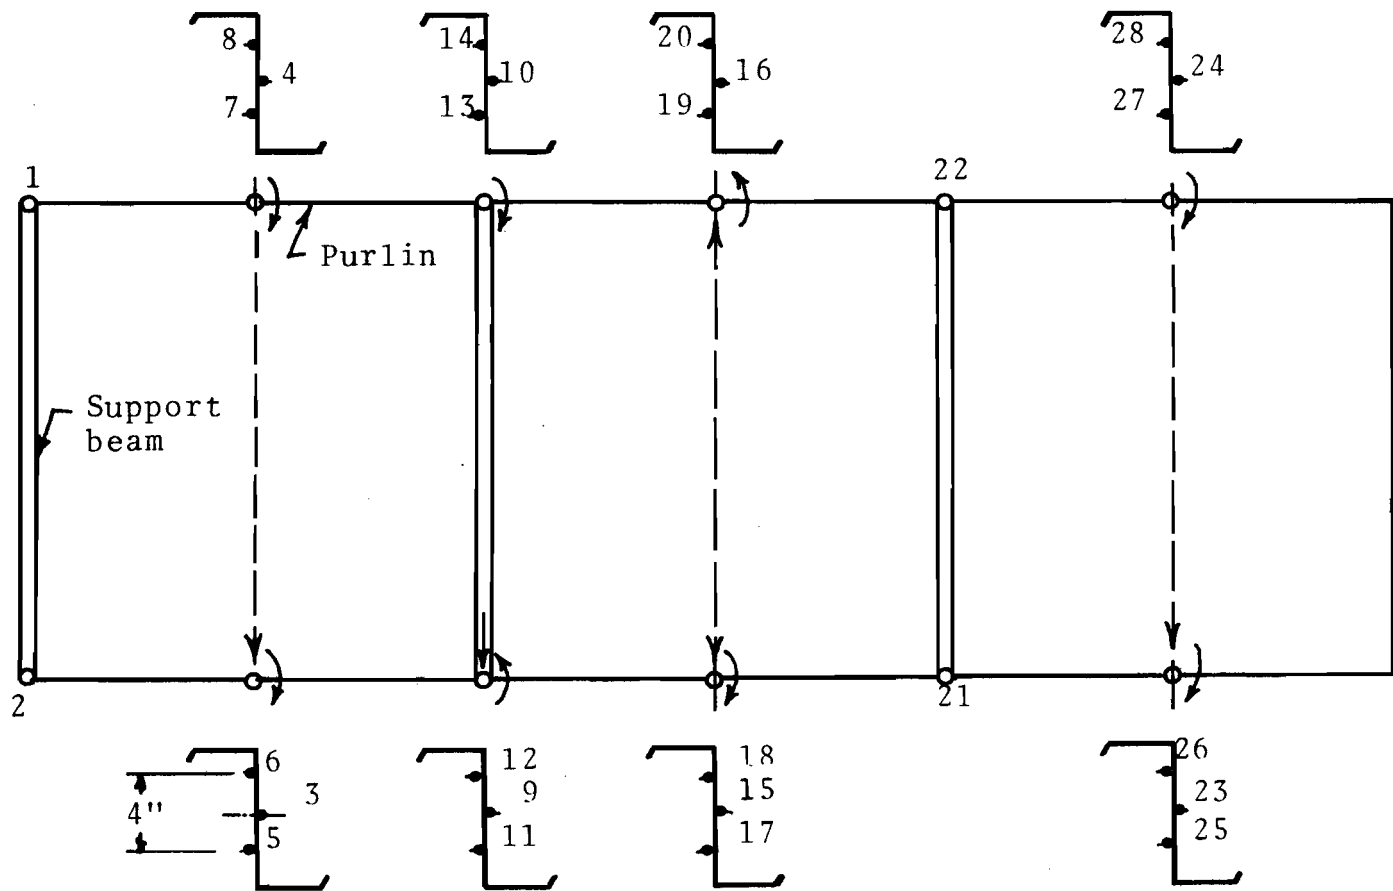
Dial Gage Location - First Z-Section Purlin Test
